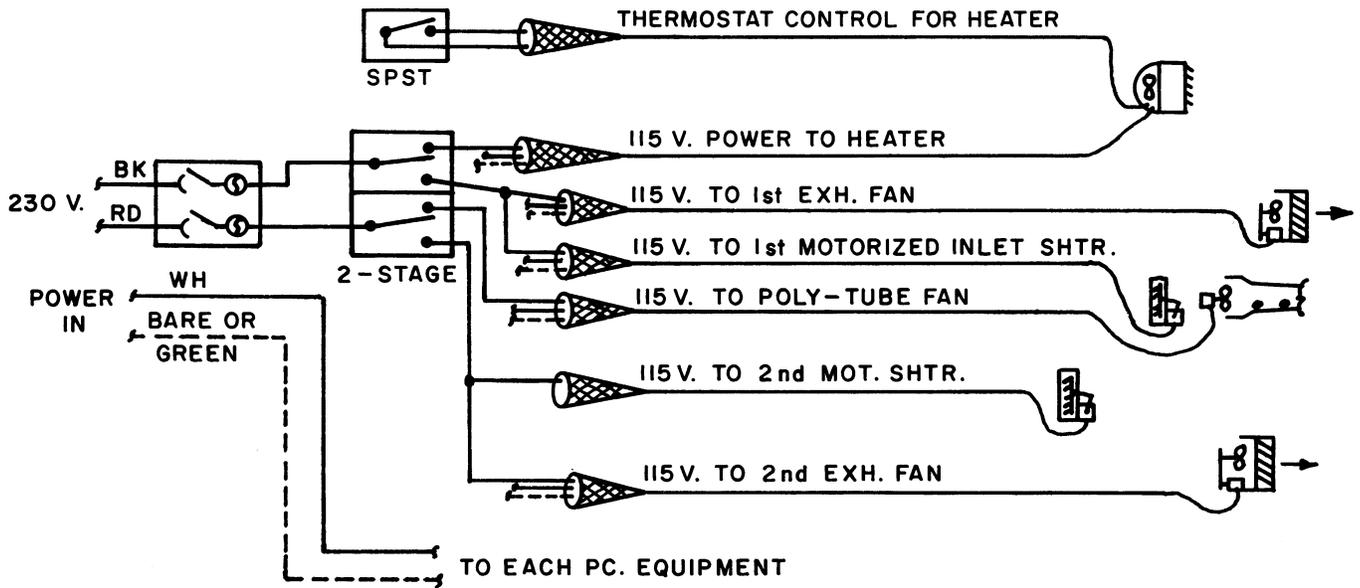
Wiring for a poly-tube heating-ventilation system with one heater, two motorized inlet shutters, and two single-speed exhaust fans.
